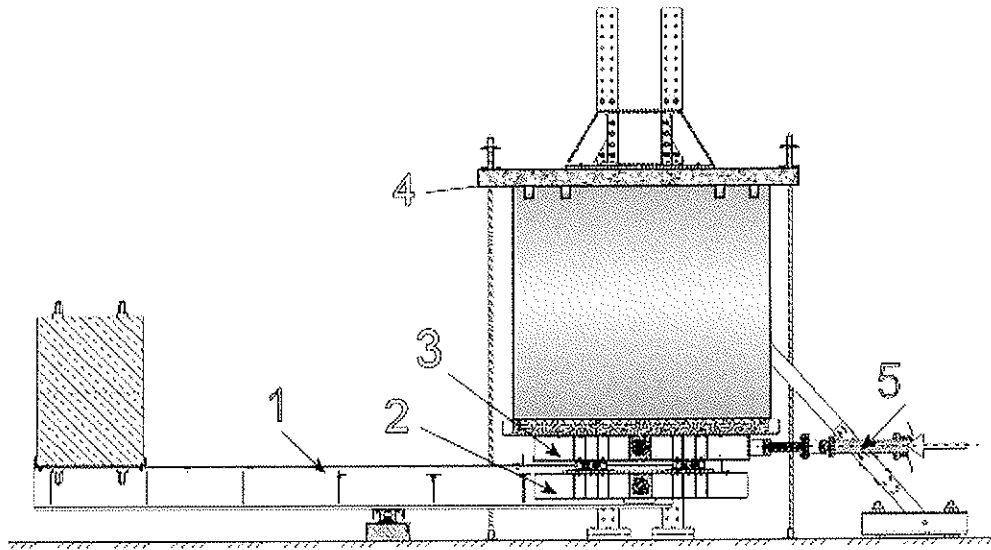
Test set-up for racking testing of shear cantilever panels turned upside-down and along the bottom edge supported by hinged and horizontally movable mechanism.
